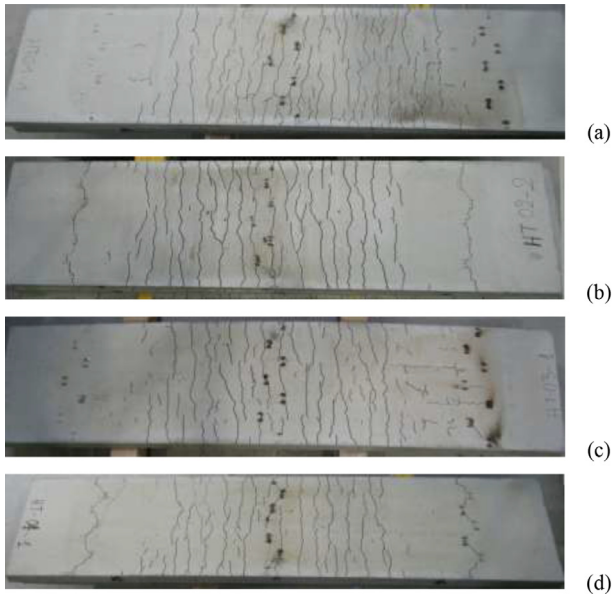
Main cracks pattern after unloading and cooling. Specimens reinforced with: (a, b) Schöck ComBAR®; (c, d) FiReP® Rebar P. (a, c) 5 mm and (b, d) 10 mm concrete cover.
